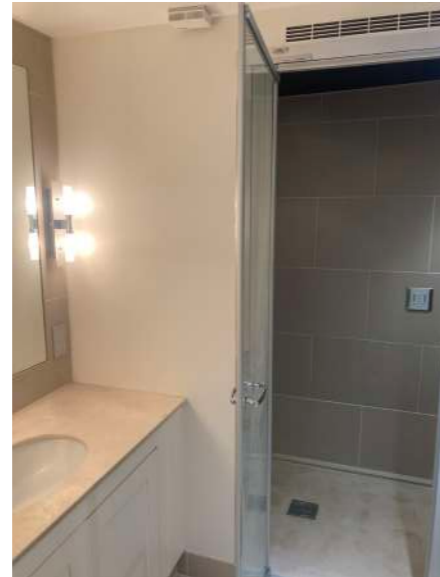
Existing modern fit-out & finishes in Bathroom 2.
